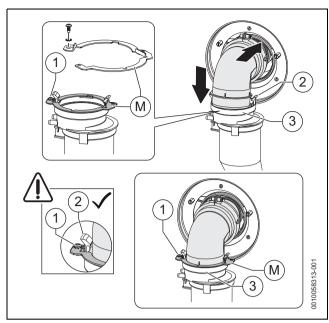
Adaptor assembly fitting to appliance exhaust outlet
